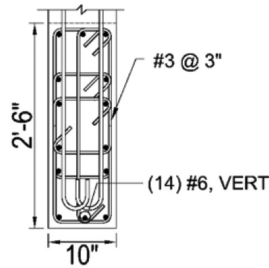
Wall cross section and reinforcement layout for T1. (Note: 1 in. = 25.4 mm.)
